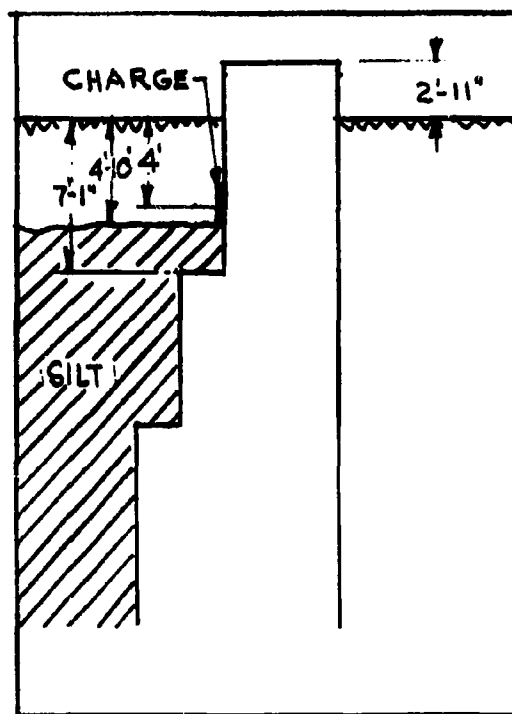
Upper guide wall of Lock 29 showing location of 35-pound charge placed 4 feet under water. Charge effectively breached wall.
